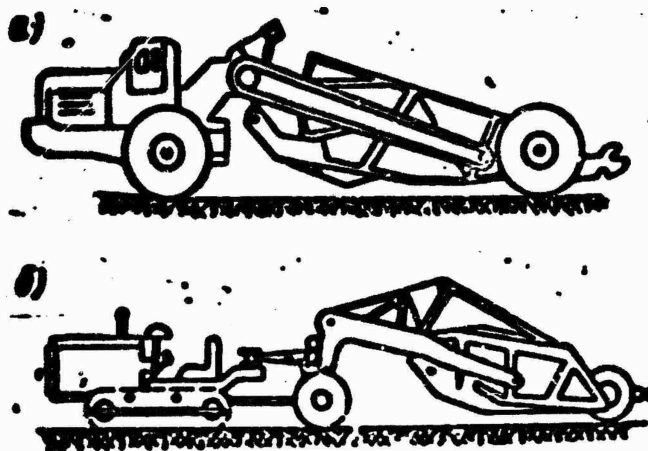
Scraper types: a) Self-propelled with a single-axis tractor; b) tractor-drawn with a crawler tractor.
